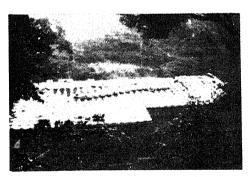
Movement of ridge roofing tile of wooden house (Irozaki)
